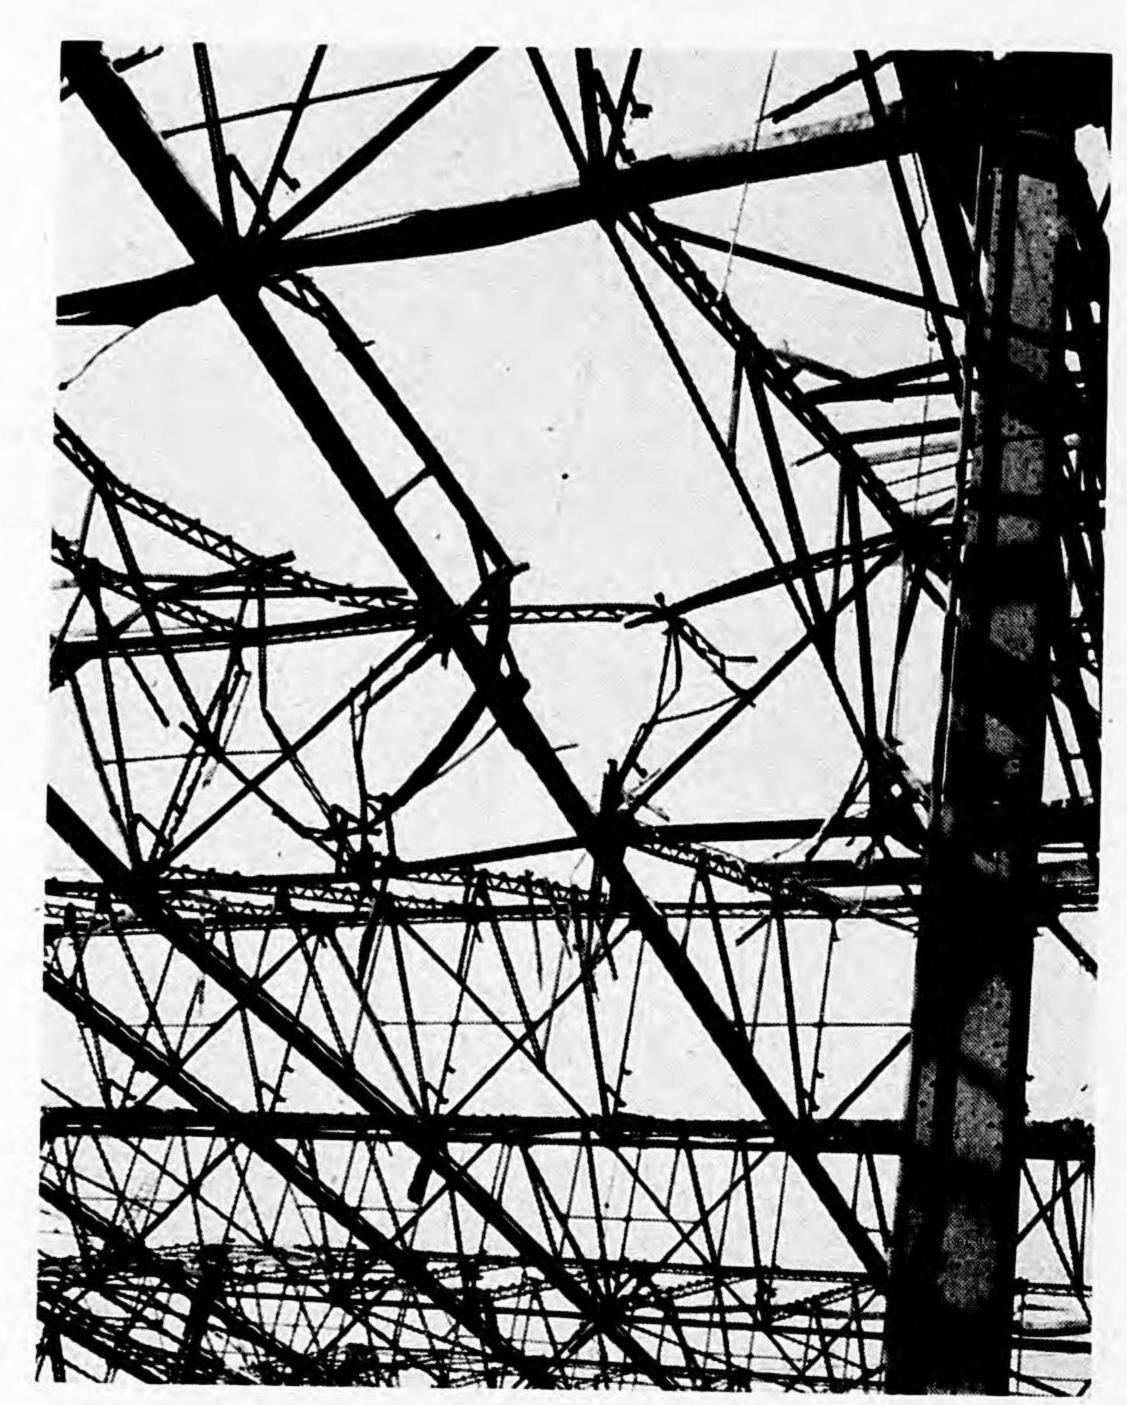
Building 2, Bomb 9; damage to roof steel.
